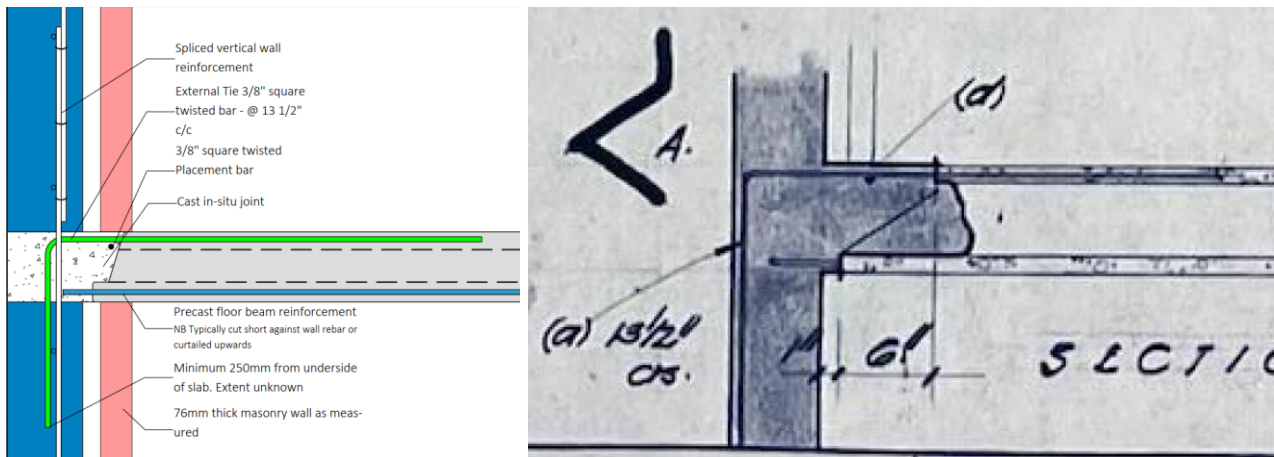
Observed External Wall to Floor Detail as Observed (left) as Intended, extract from record drawings (right)
